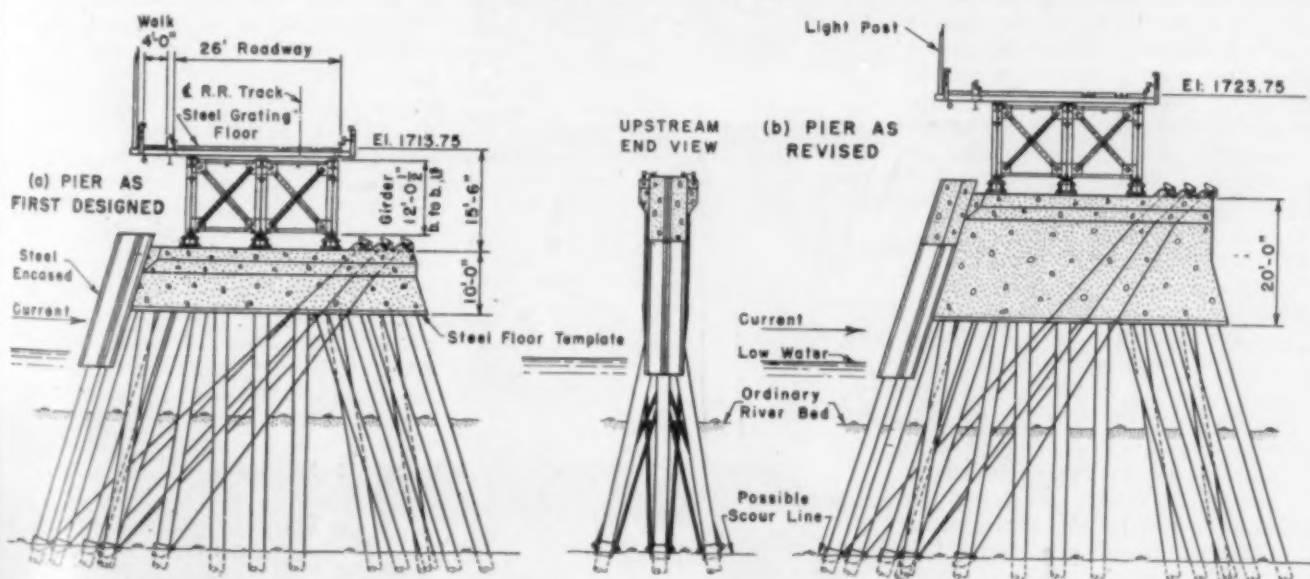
DRAWING SHOWS details of tubular steel pile pier: (a) as first designed: and (b) as revised to give 10-ft additional height. Two piers completed according to original design, except for cable bracing, withstood extraordinary forces of ice jam in river this spring.
